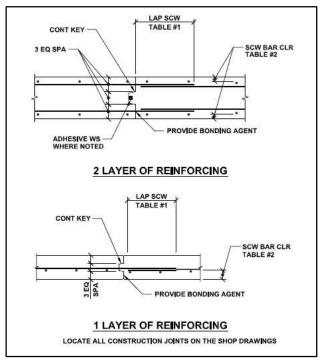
Typical Concrete Wall or Slab Construction Joint
